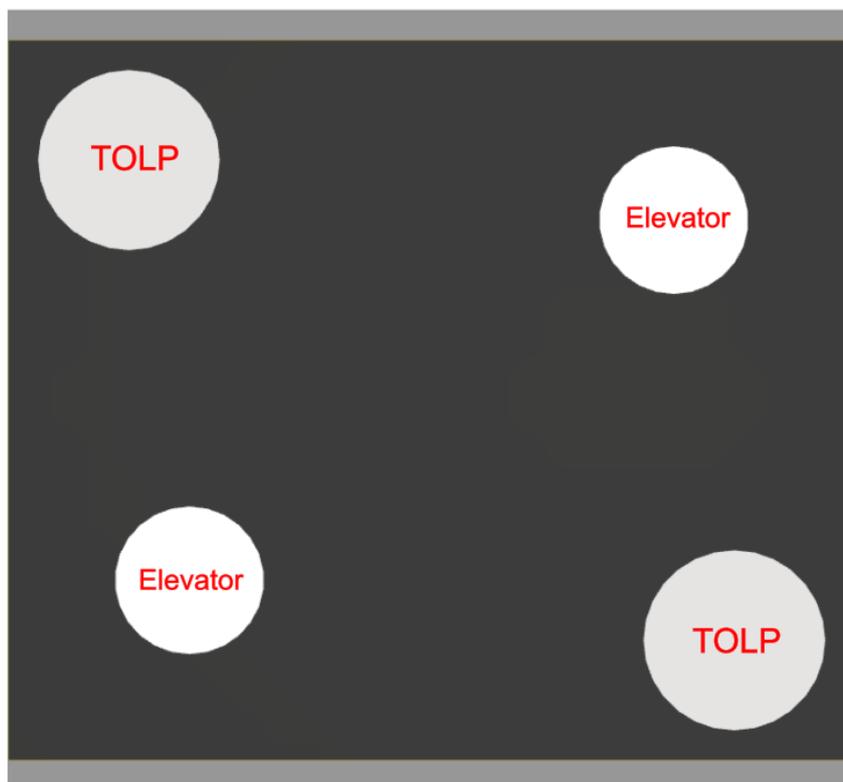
Vertiport flight deck layout, it shows the 130 m x140 m large flight deck with its two TOLPs and elevators which symmetrically distributed on it.
